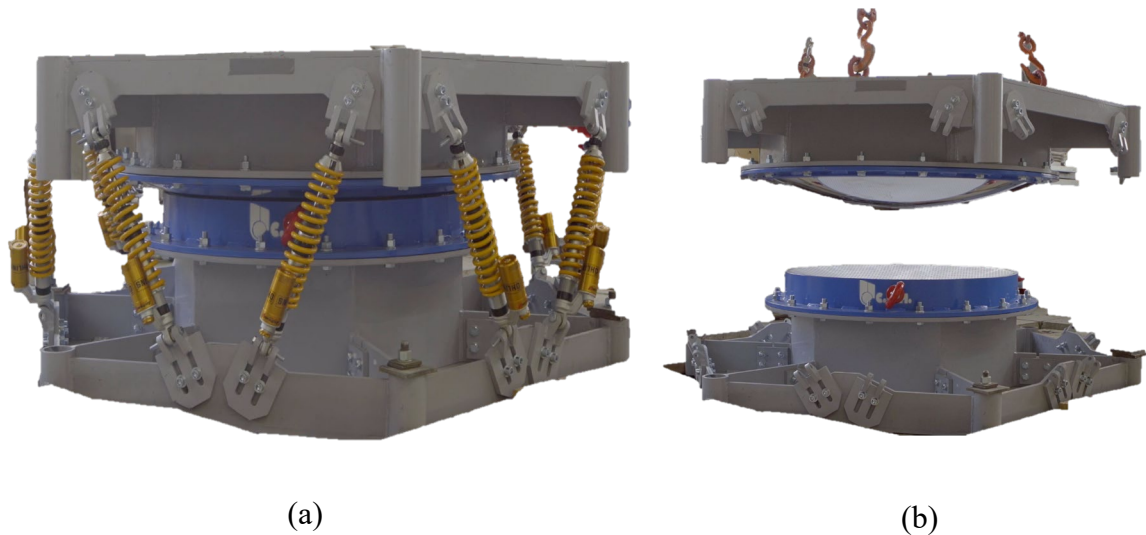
TROCKSISD prototype (a) with the view of spherical frictional surfaces (b).
